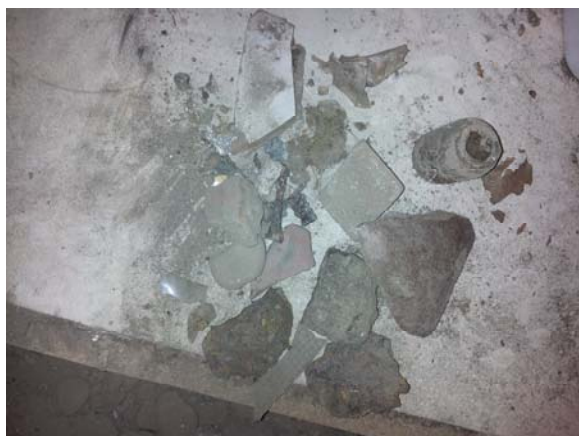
Typically fill found beneath the foundation slab of GK Jeans and Pearl Vision.
